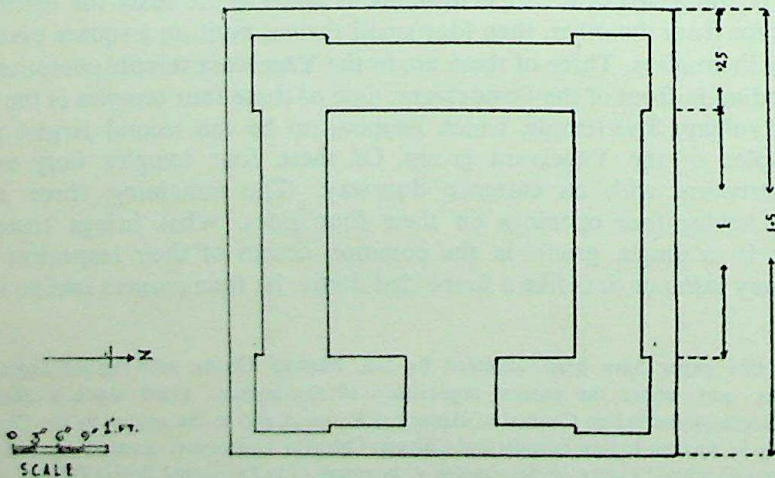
Ground plan of Temple No. 1 (Jageswar, Pl. 25)
